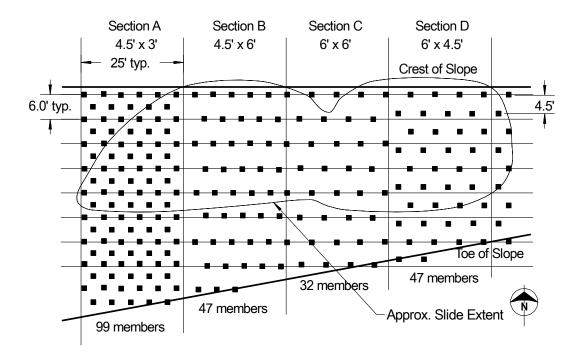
Plan view of selected stabilization schemes for slide area S3 at the I70-Emma test site.
